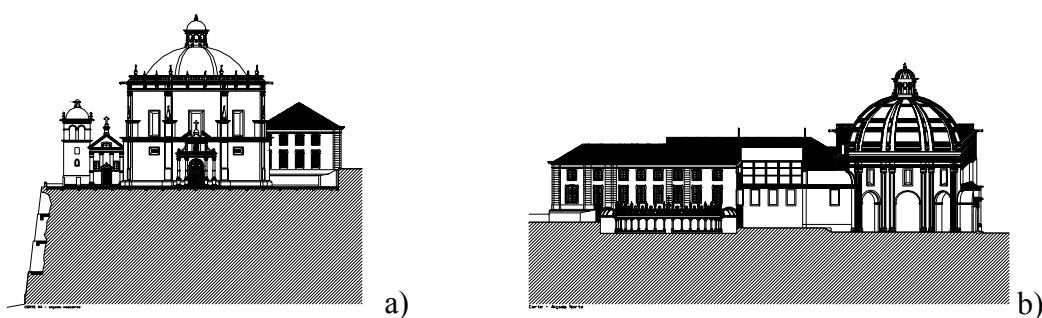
Schematic representations of the monastery. (a) Frontal elevation and (b) longitudinal section
